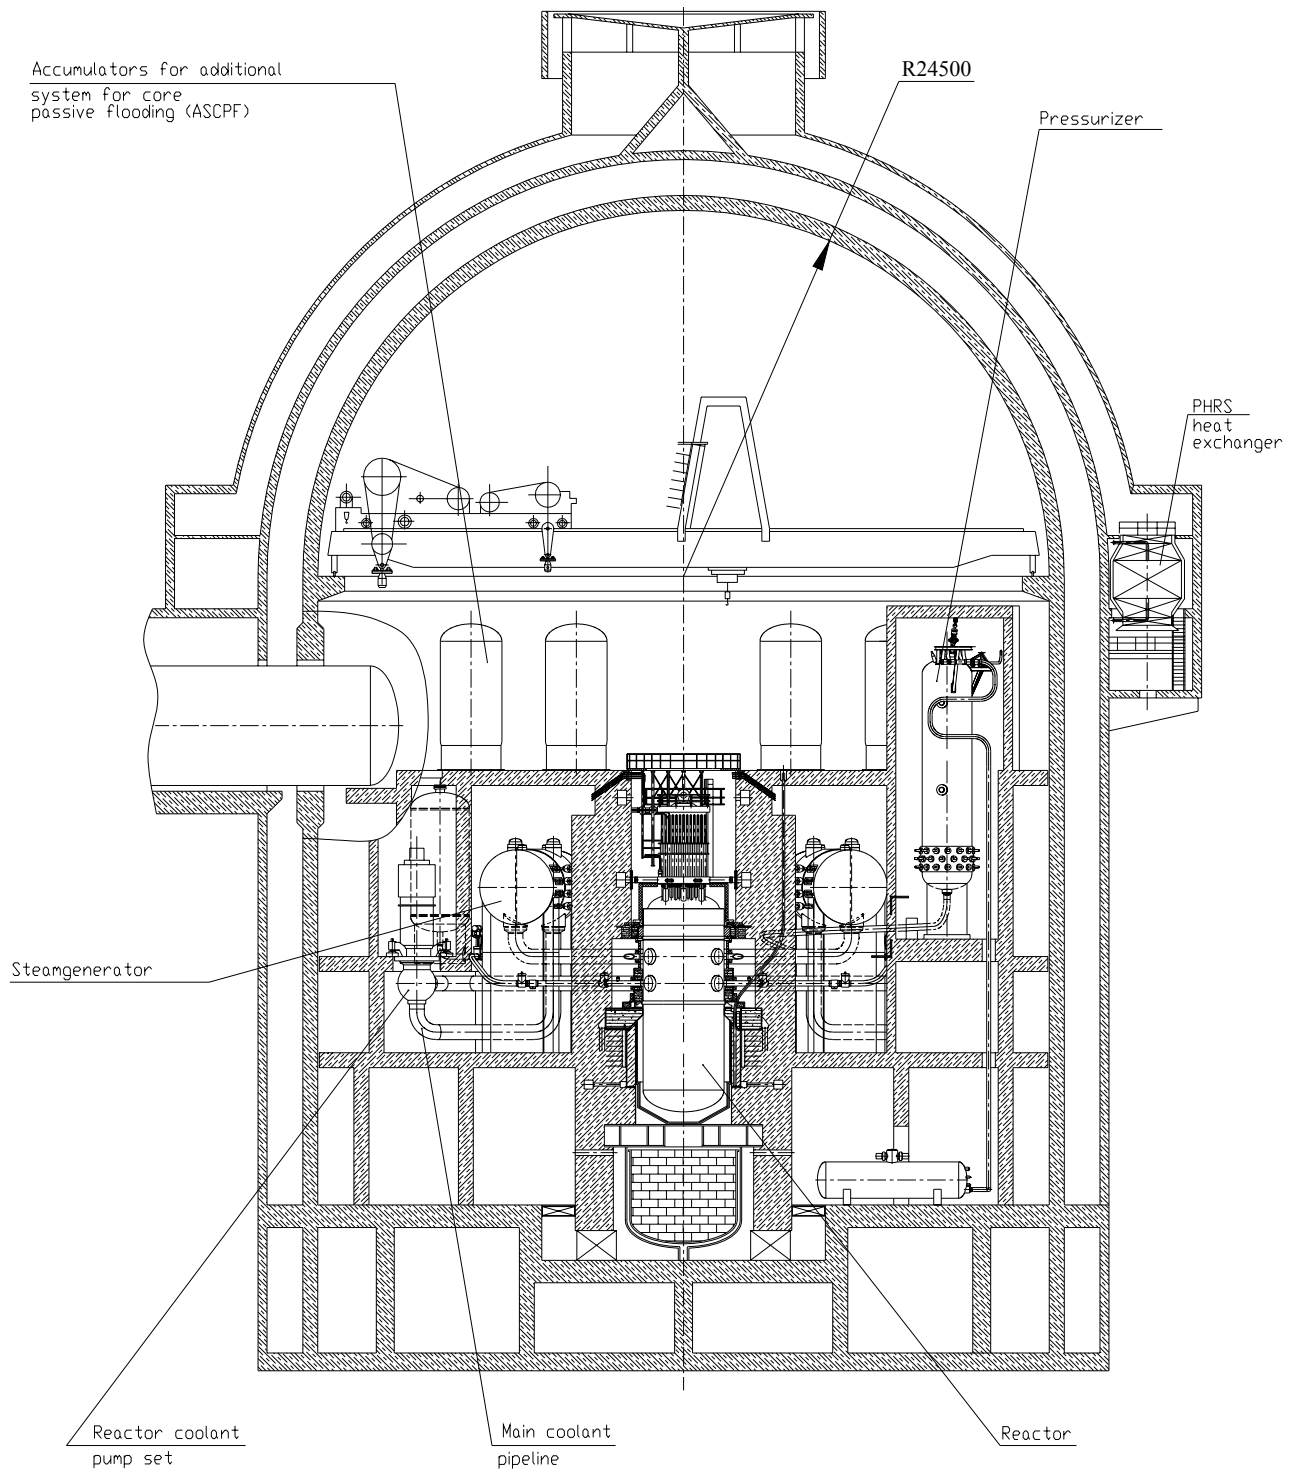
Layout of the RP V-448 equipment (longitudinal section)
